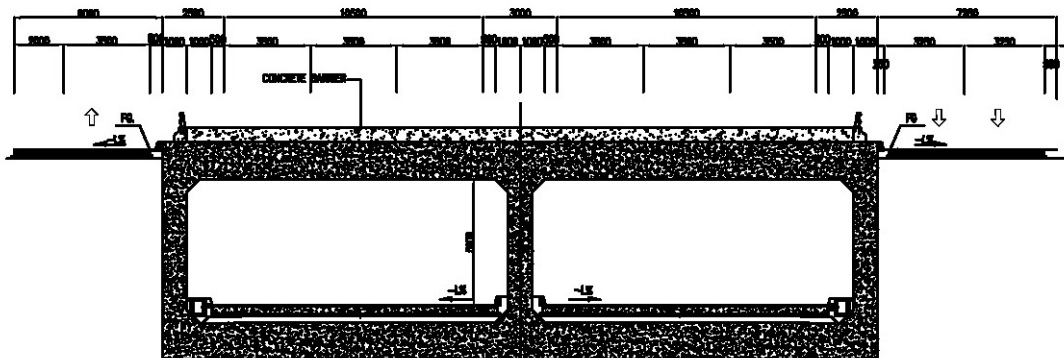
Typical Cross Section of Bridge Structure (PC-U Girder)
